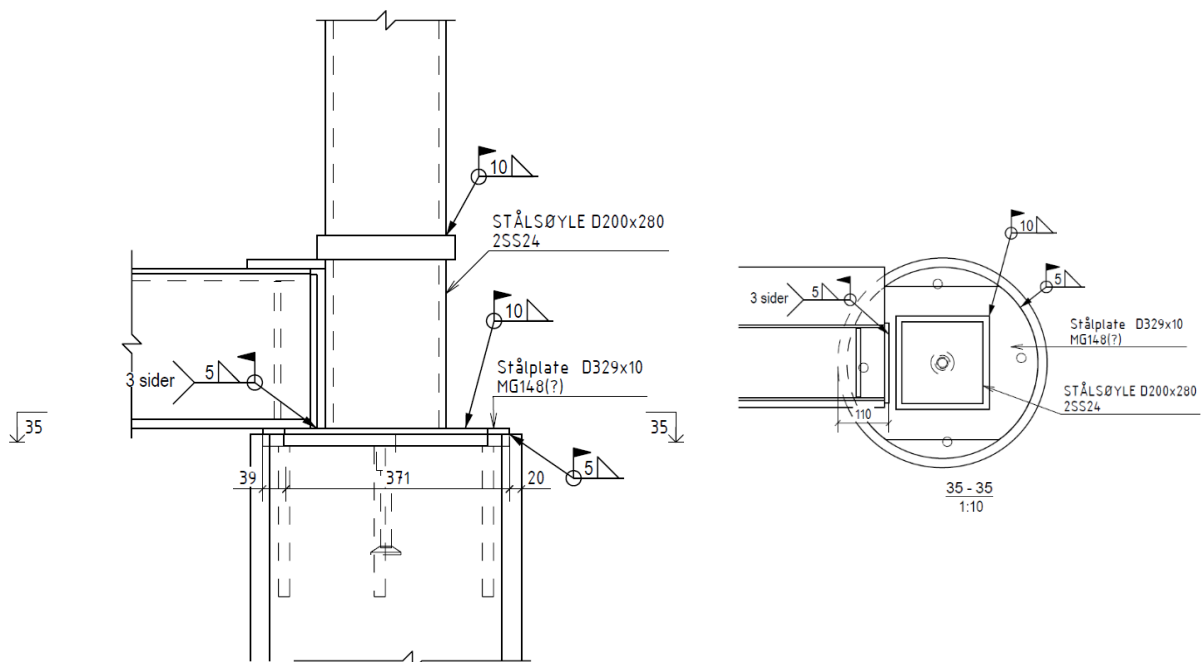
Steel beam, steel column, and a reinforced concrete column connection provided by the consulting company Core Technology
